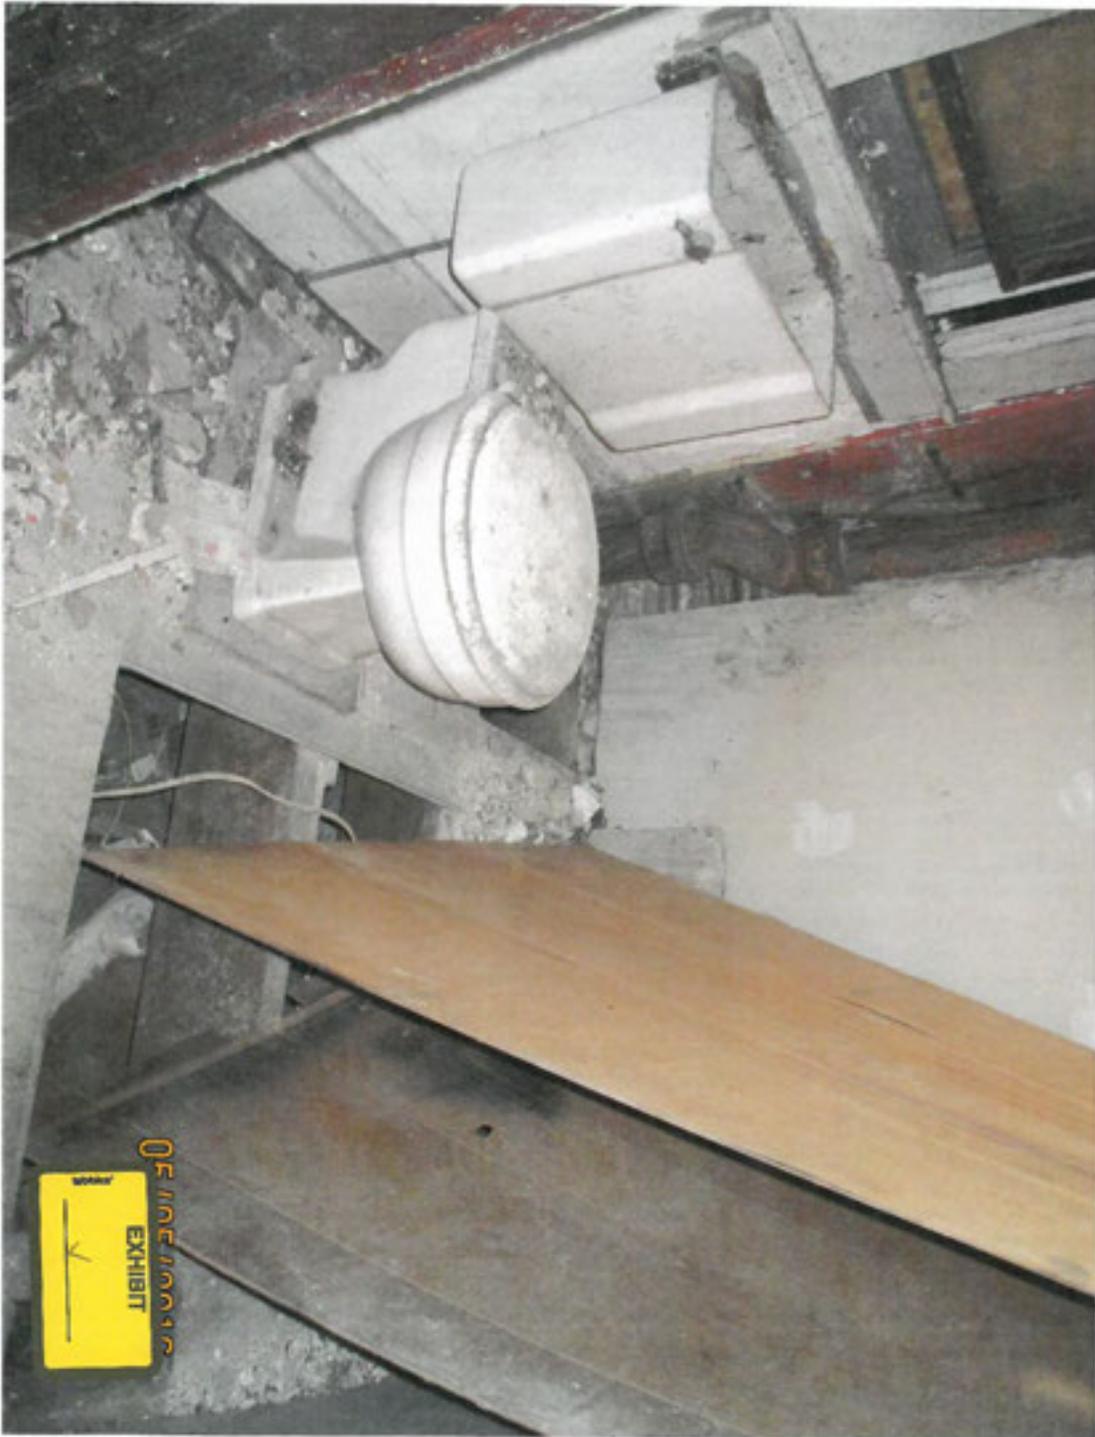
EXHIBIT K: Interior Photo depicting extensive ceiling rot and damage
